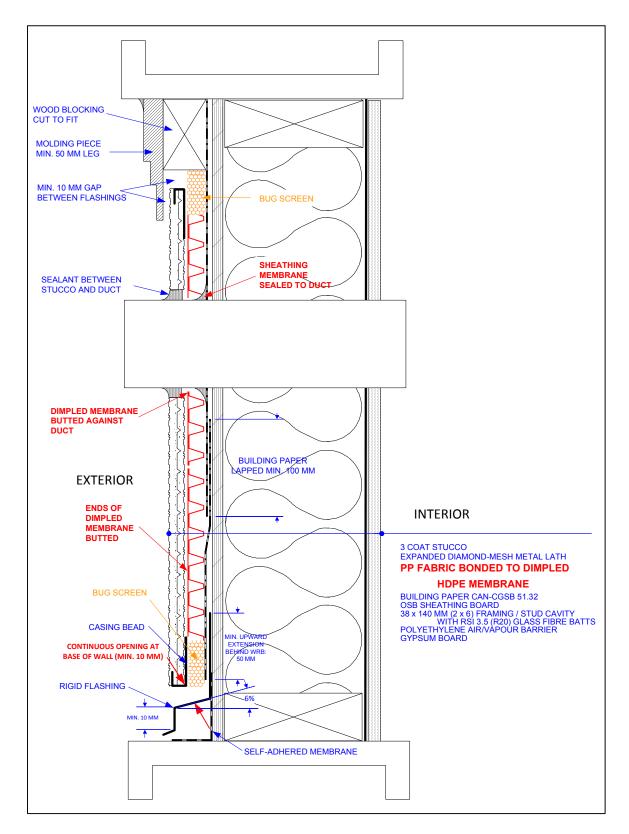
Client E Wall vertical cross section Option 2 – Ventilated detail
